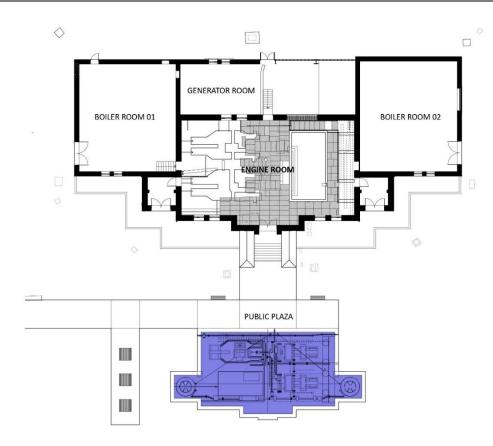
Existing Floor Plan – Carrington Hydraulic Engine House 2021. EJE Heritage
